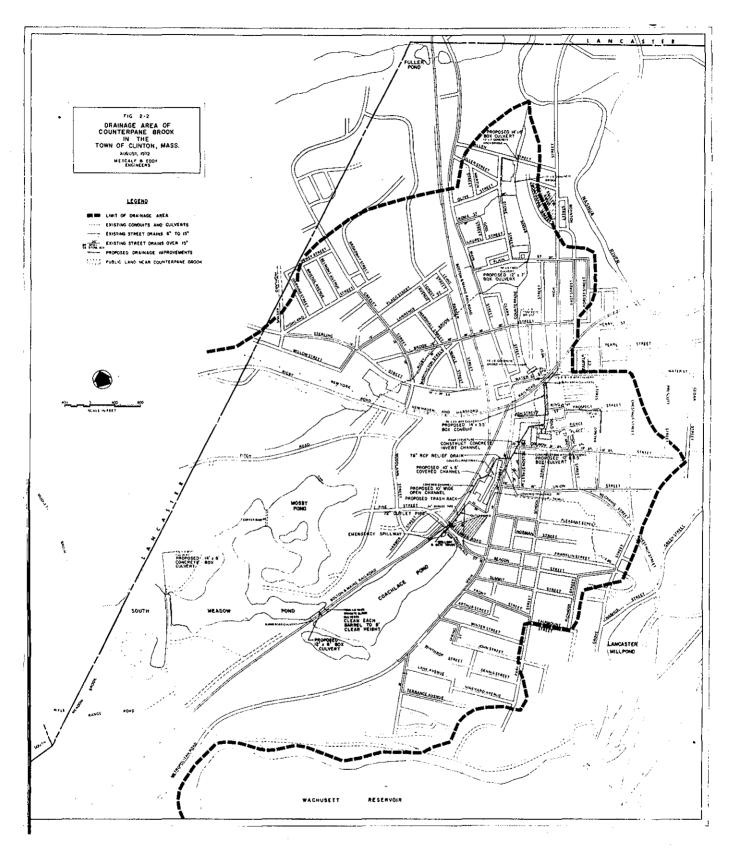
DRAINAGE AREA OF COUNTERPANE BROOK
